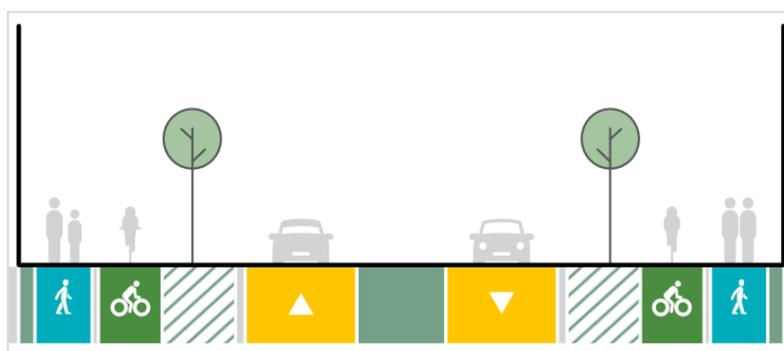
SH16 Main Road Upgrade Typical Cross Section
